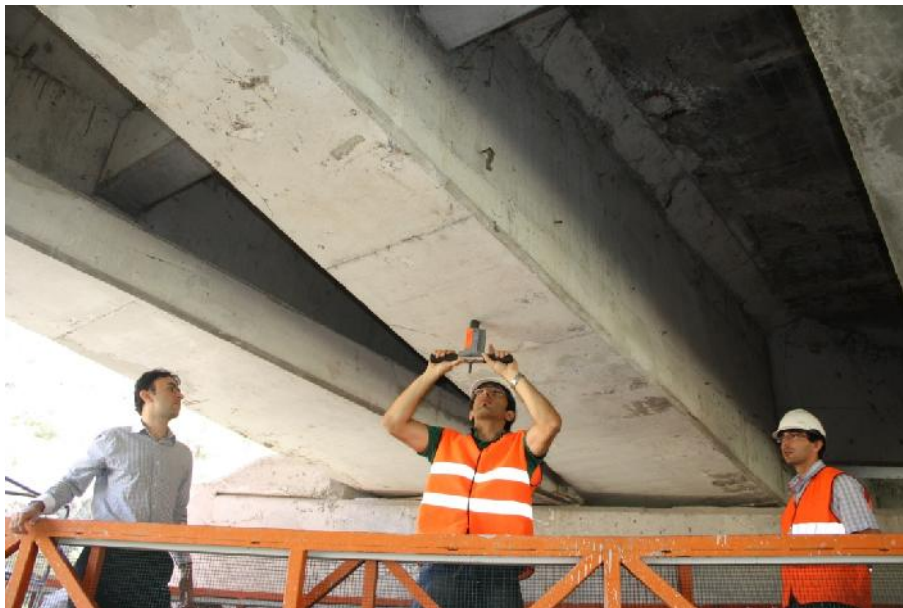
Application of penetration resistance device on a reinforced concrete bridge girder.
